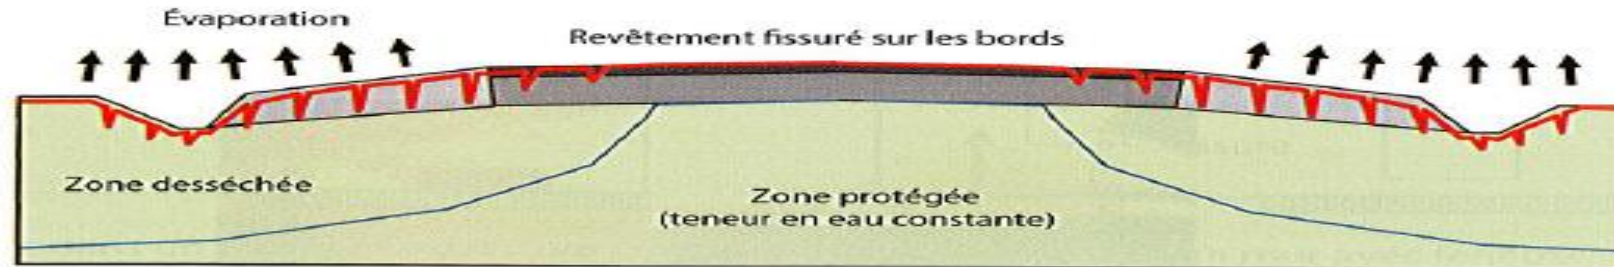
Longitudinal cracks near the edge of pavement
